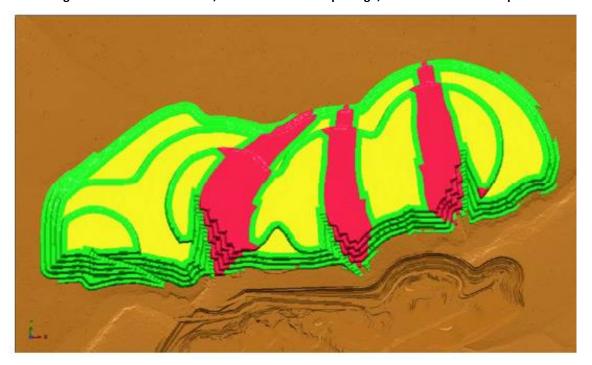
Sentinel Pit, ultimate waste dump design, 2015 Mineral Reserve plan
